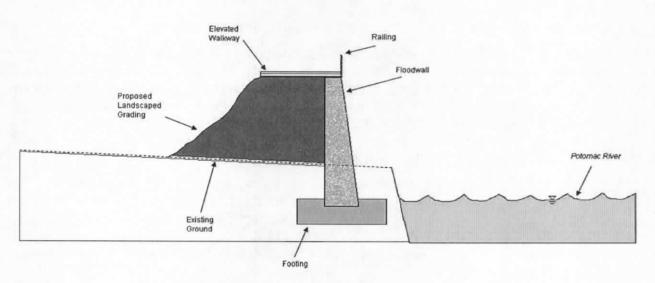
Proposed Elevated Walkway Example Cross-Section
